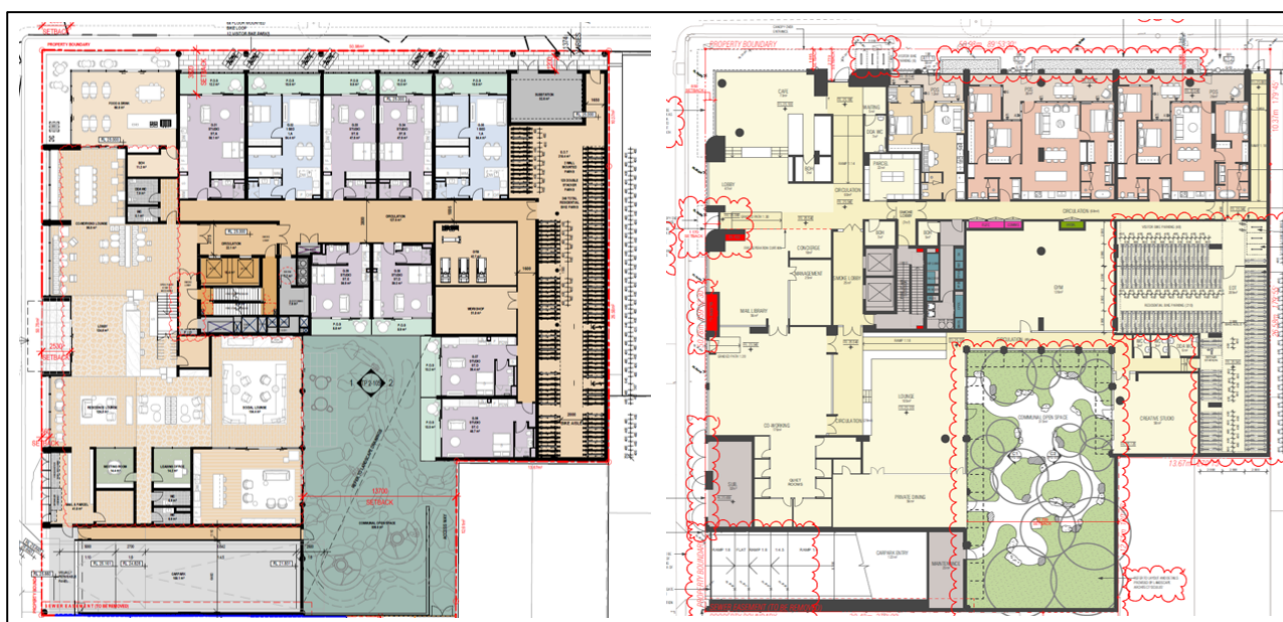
Approved ground floor plan on the left (Source: JBC Architects, dated 07.11.2024) Amended ground floor plan on the right (Source: FK Architects, dated 10.03.2026)
